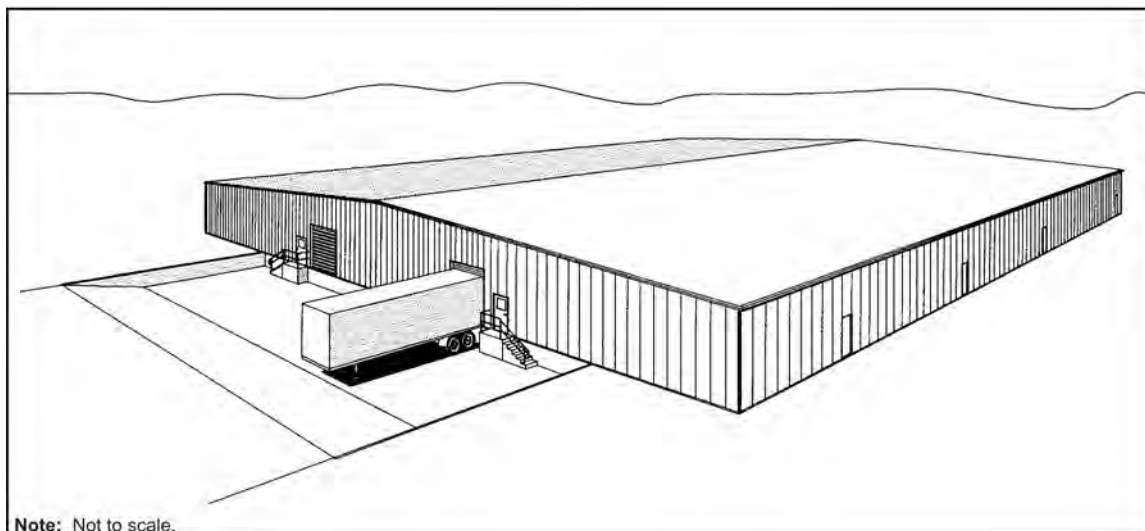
Exterior Representation of a New Mercury Storage Facility
